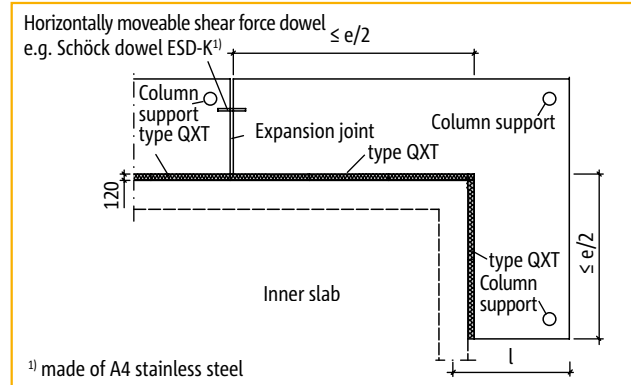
Layout of the expansion joints for balcony slabs which goes around a corner
